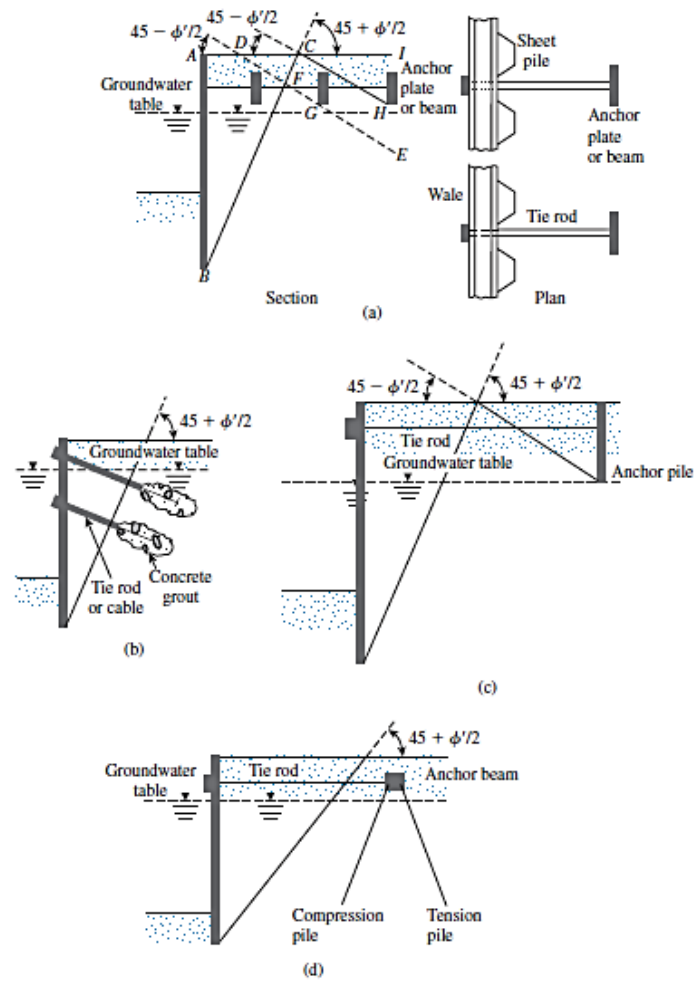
Various types of anchoring for sheet-pile walls: (a) anchor plate or beam; (b) tieback; (c) vertical anchor pile; (d) anchor beam with batter piles
